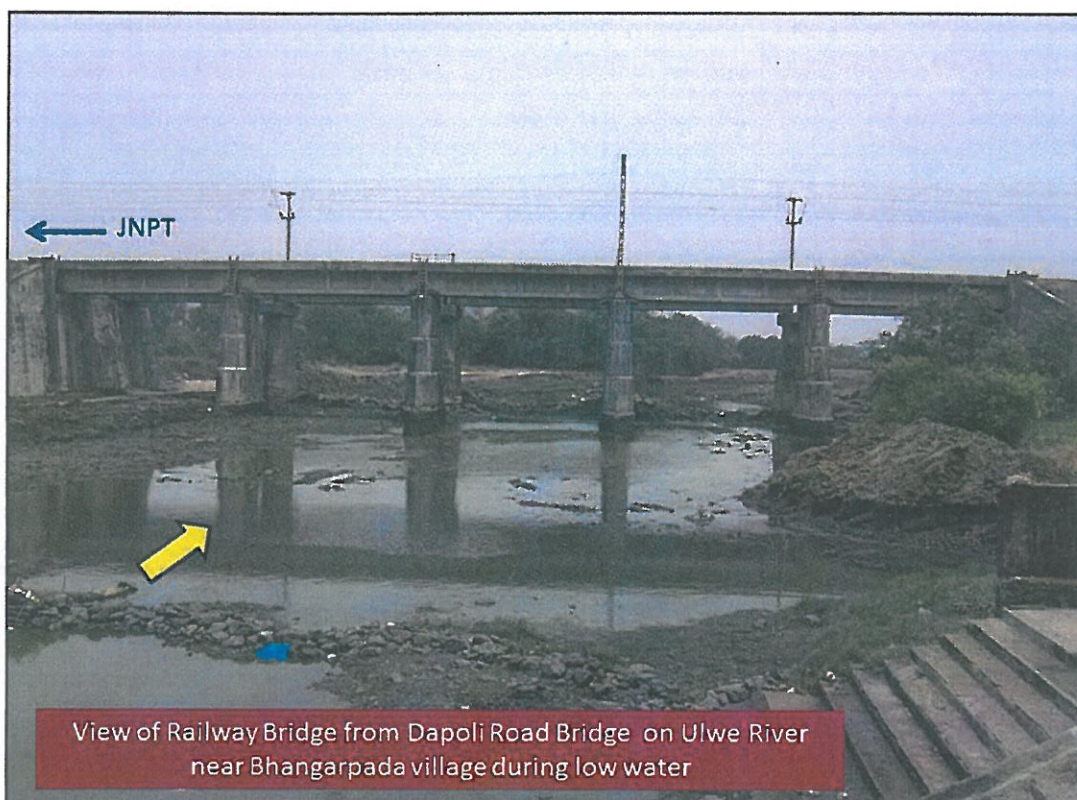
VIEW OF RAILWAY BRIDGE ON UPSTREAM OF ULWE RIVER DIVERSION
